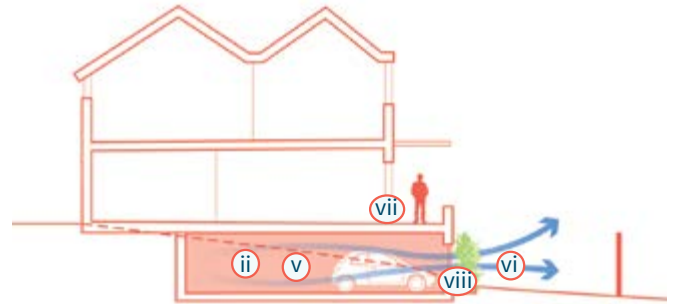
For basement and sub-basement car parking, using landscape screening at openings facilitates natural cross ventilation.
